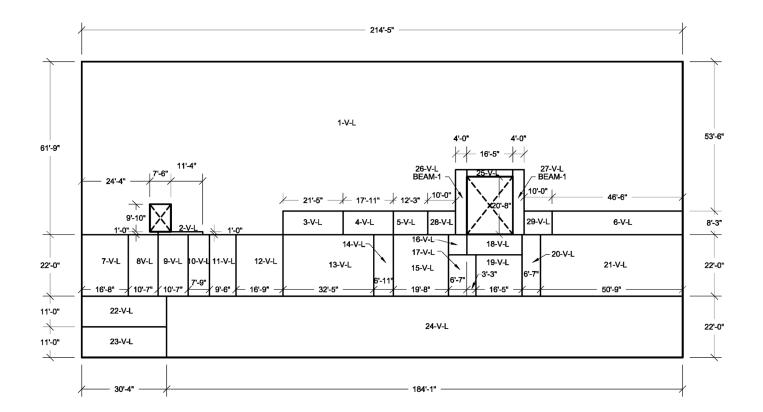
H.3-9 North Wall Looking South Vertical Reinforcement Zones Near Side Face
